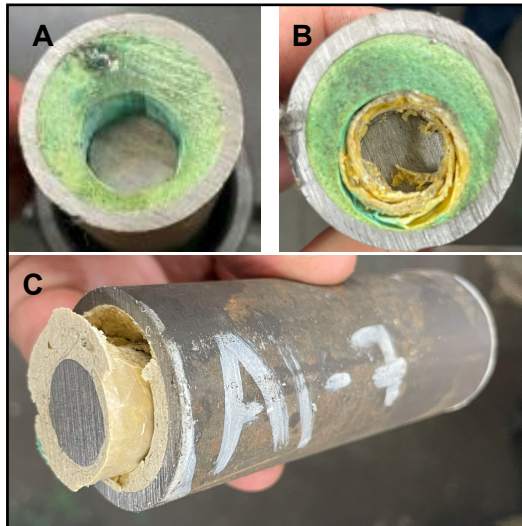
Photos showing the different failure mechanisms: A- Bolt/resin failure, B – Gloving, C – Plug failure.
